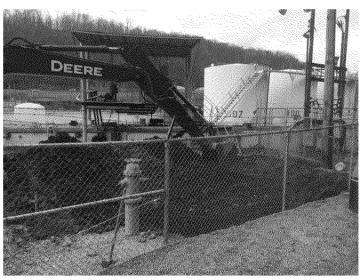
; Taken on 02/25/14 at 16:16 hours by START GN. Excavating 6-9" soil/gravel in vac trailer parking area.
